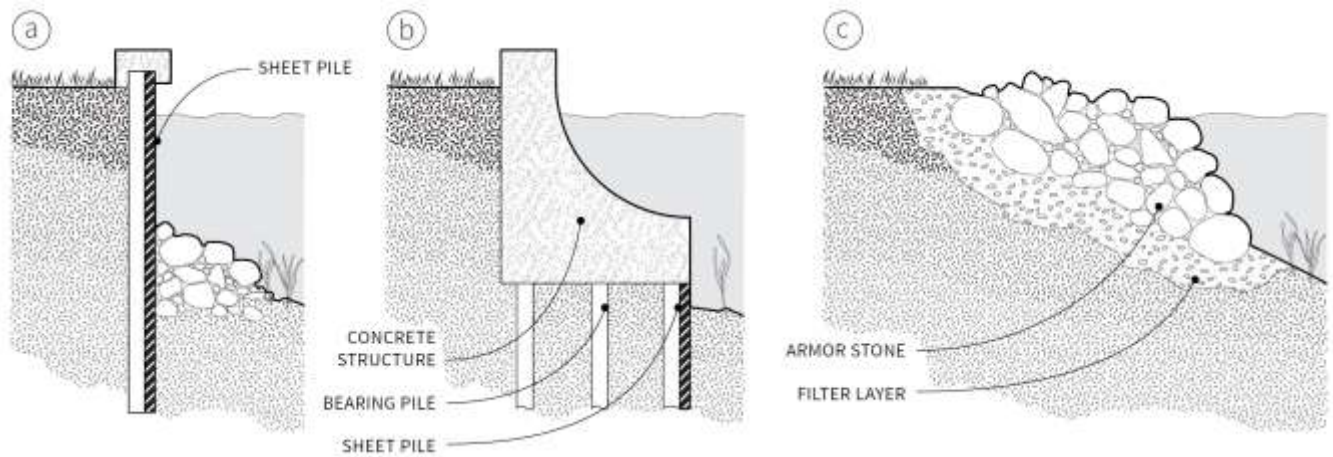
Typical concrete seawall designs for coastal protection: a) Vertical seawall, b) Curved seawall, c) Riprap (redrawn based on [18]).
